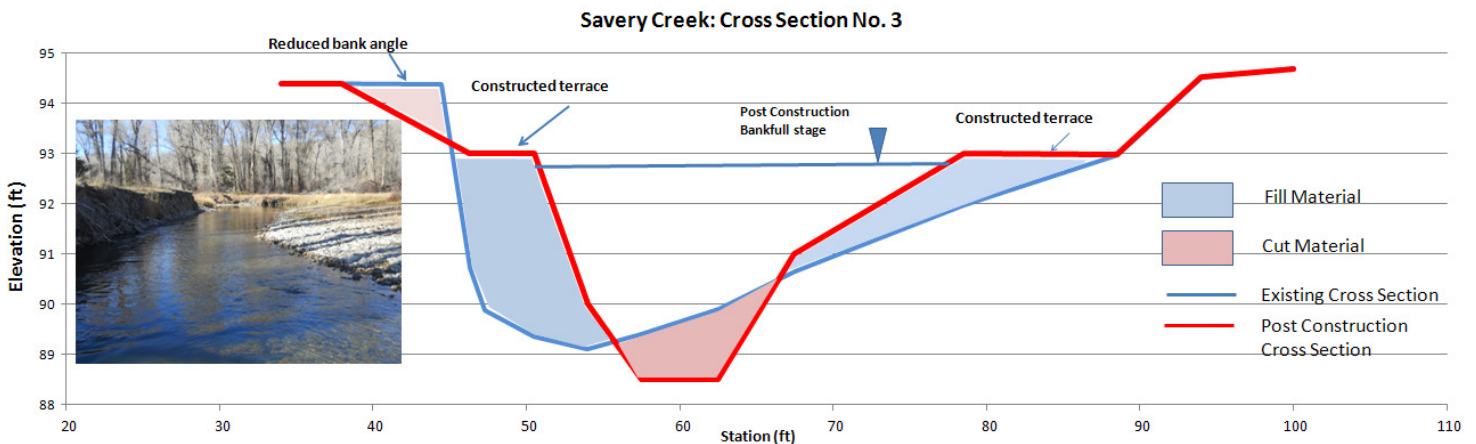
Example Modified Cross Section to Restrict Channel Width
